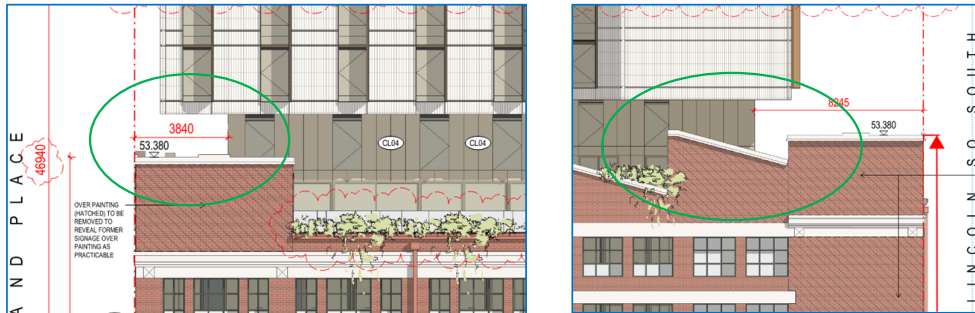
Excerpts of north (left image) and east (right image) elevations of the proposal (Source: Hayball – revision 2, dated May 2025). Green highlight by officer.
